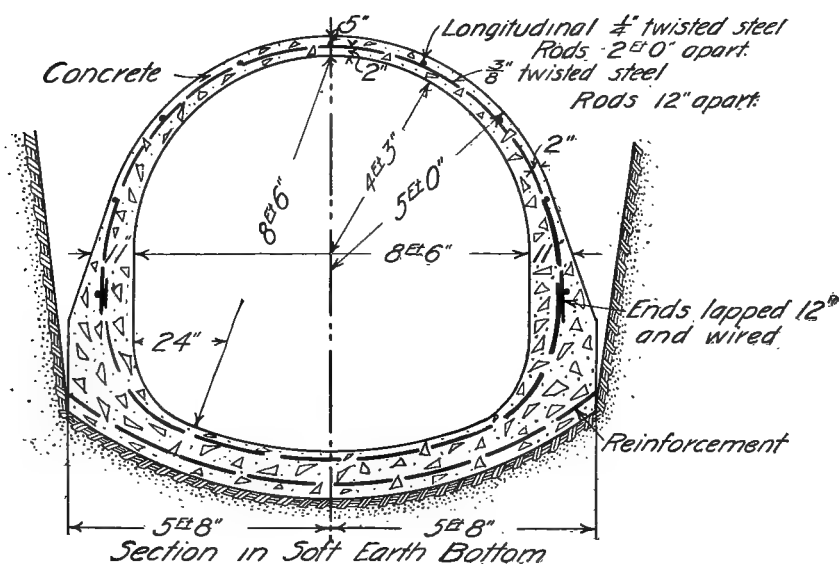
TYPICAL CROSS SECTION, JERSEY CITY CONDUIT.
